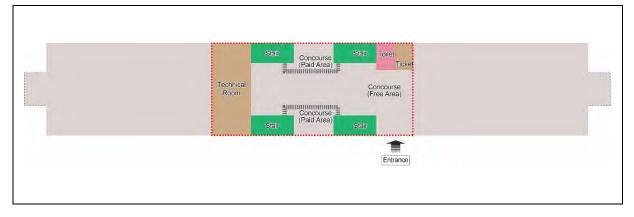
Prototype Station Building Plan of Elevated Type Small Station
